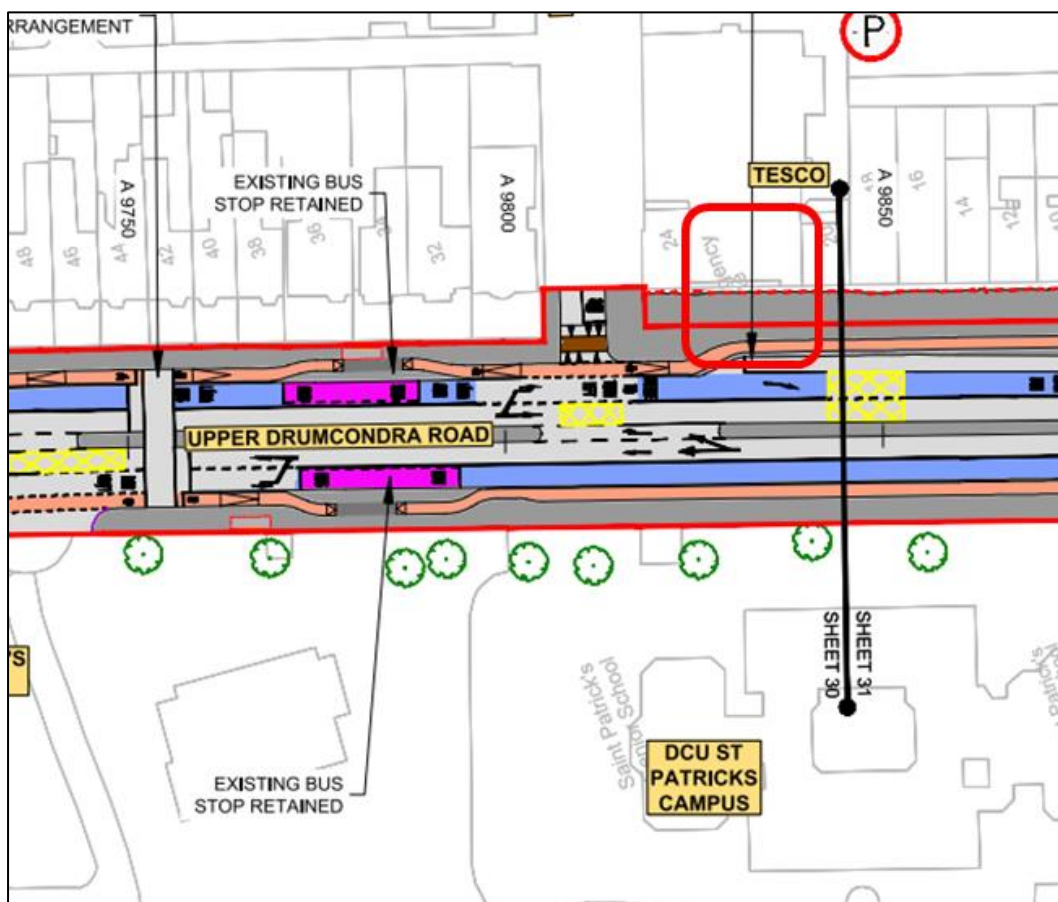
Proposed new Layout on Upper Drumcondra Road
